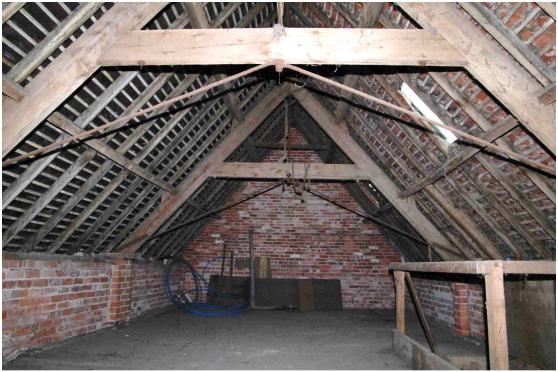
North barn, first floor Looking east. The bolted roof structure suggests a mid to late 19th century date
